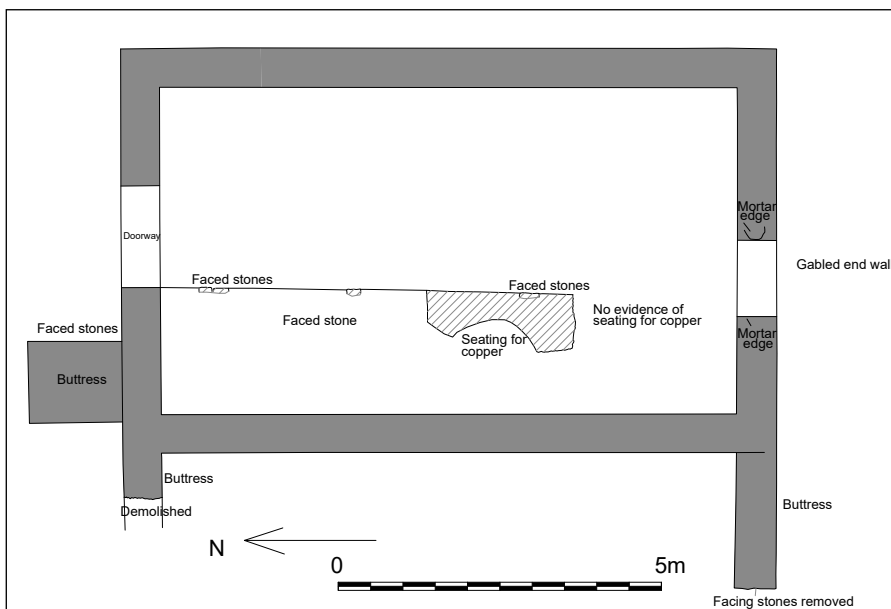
Fenton Hill: plan of Boiling House (Structure B), by R. Leech
